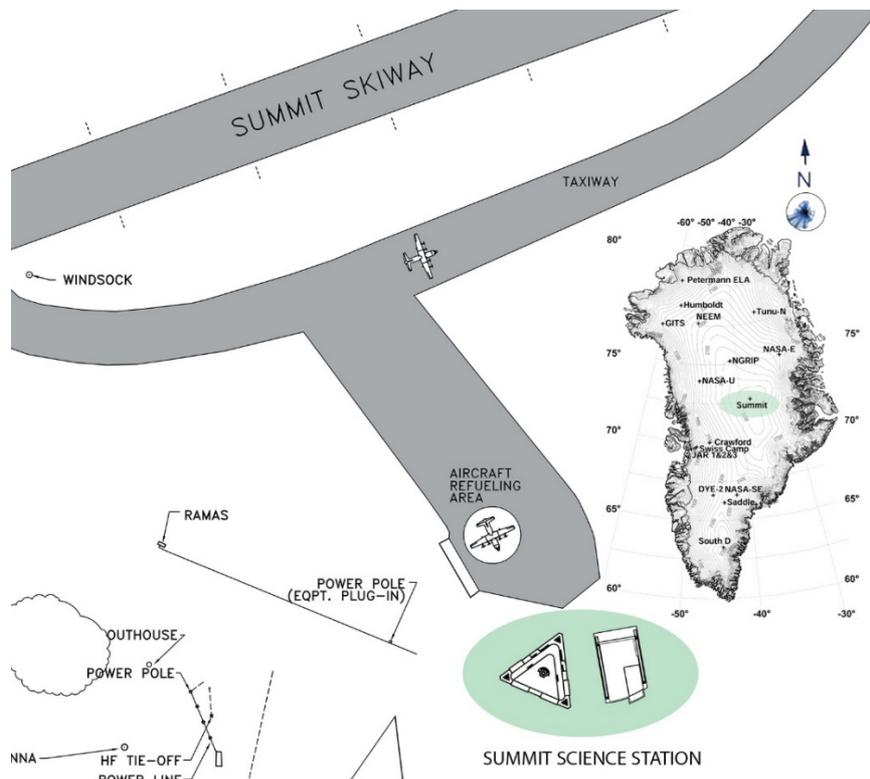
New Summit Station site map (1-main building; 2-secondary structure) and station location in Greenland.
